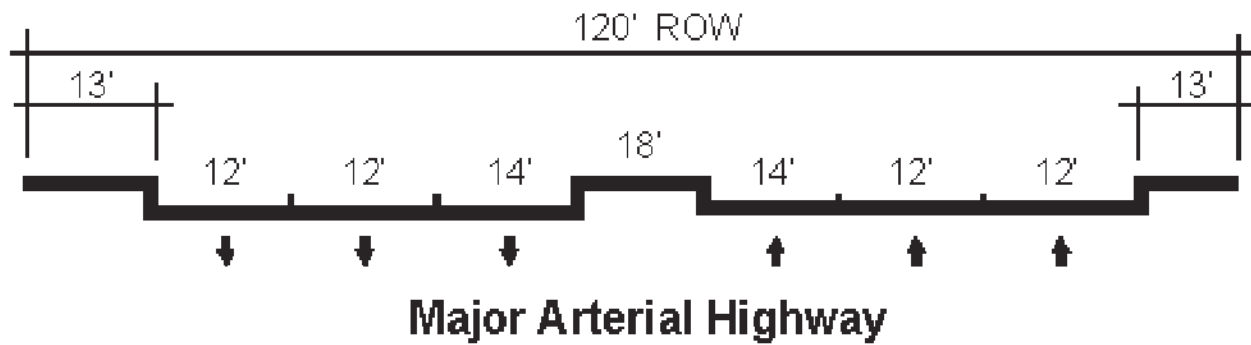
(2OF2): CITY OF RIALTO GENERAL PLAN ROADWAY CROSS-SECTIONS
